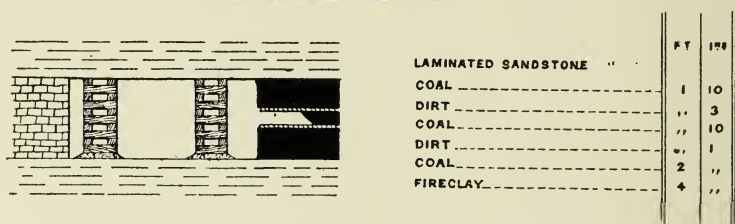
PEMBERTON COLLIERY, NEAR WIGAN, LANCASHIRE. METHOD OF TIMBERING A WORKING PLACE ON THE ORRELL FIVE FEET SEAM.
